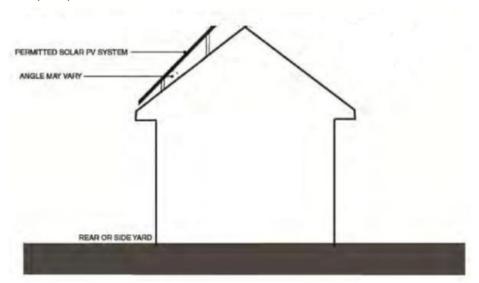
Illustration of an angled roof panel facing rear or side yard.
